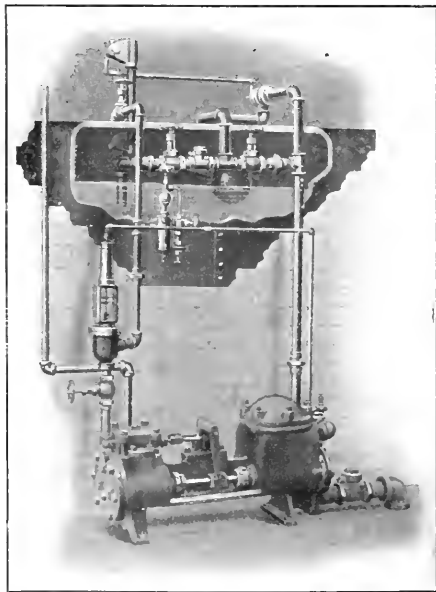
PIPE CONNECTIONS OF HYDROSTAT AND PUMP
